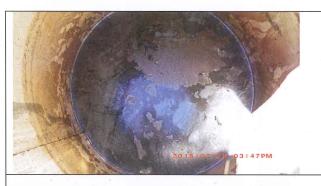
New catch basin at Premier Signs – Requested Premier's contractor to install stormwater baffle to capture floatables.
